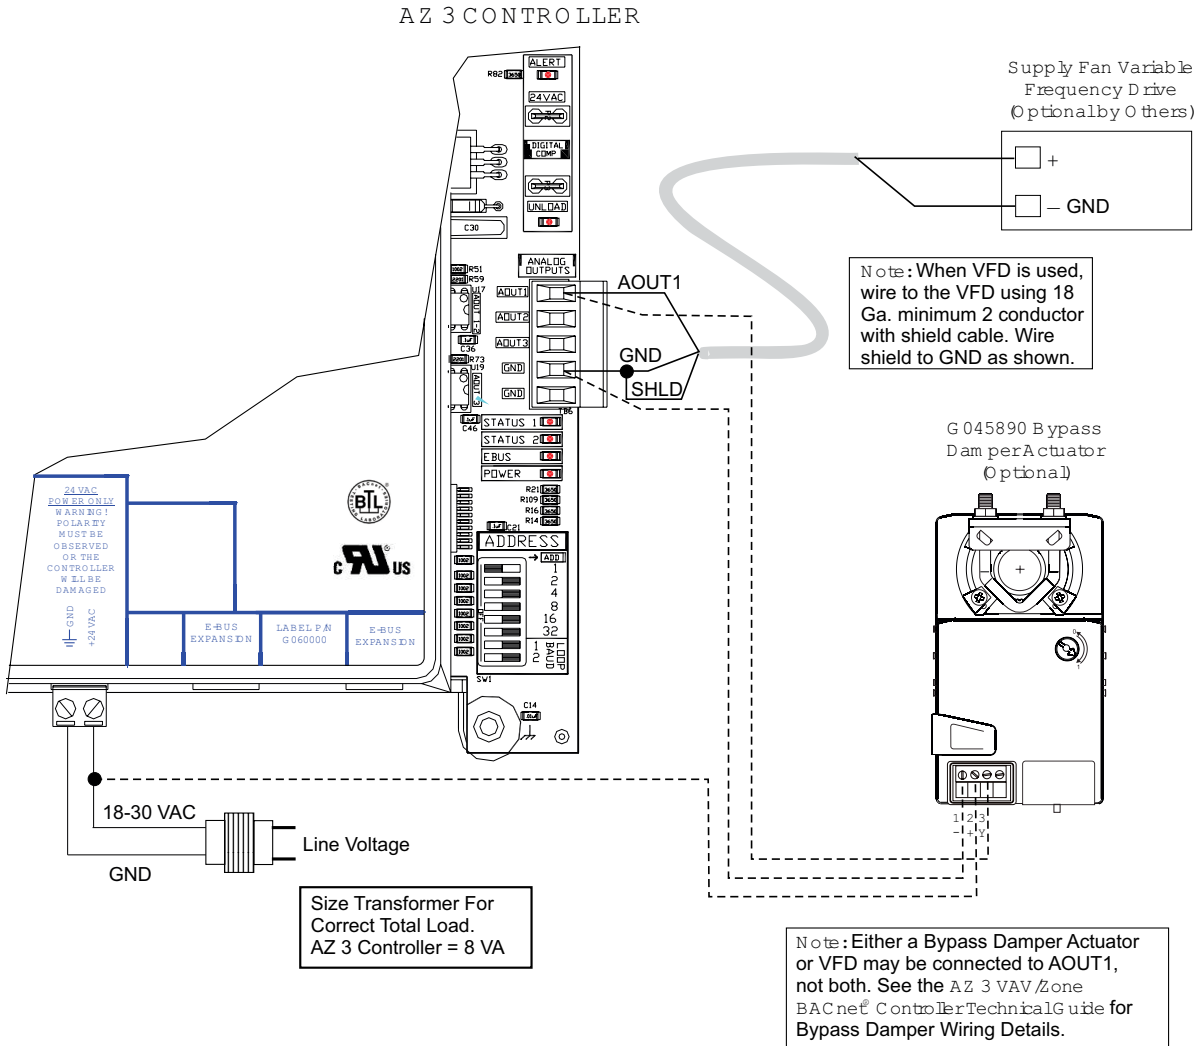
Supply Fan VFD Signal Wiring or Bypass Damper Actuator Wiring
